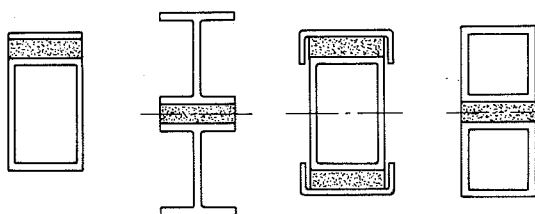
Cross-sections of sandwich beams with one or more flexurally stiff faces.
